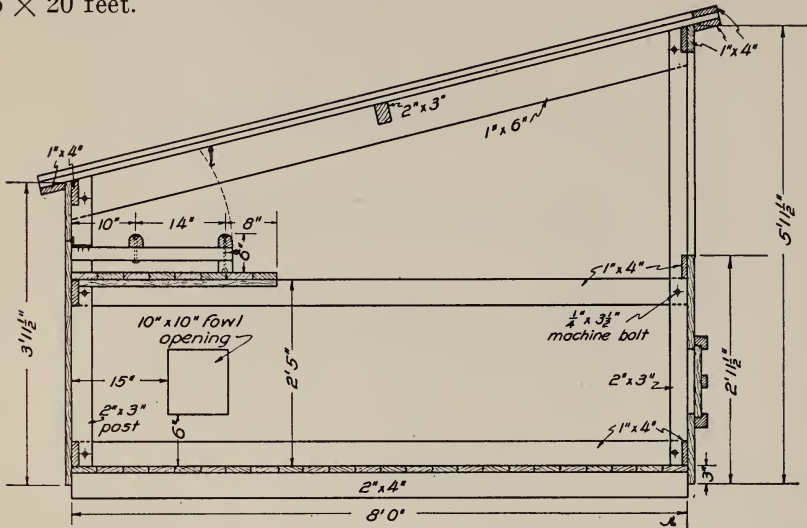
Cross section of 8 × 8 foot knock-down poultry house showing how the side walls are constructed and how the 2 × 3 inch center roof support fits into openings cut into the side walls to receive it.
